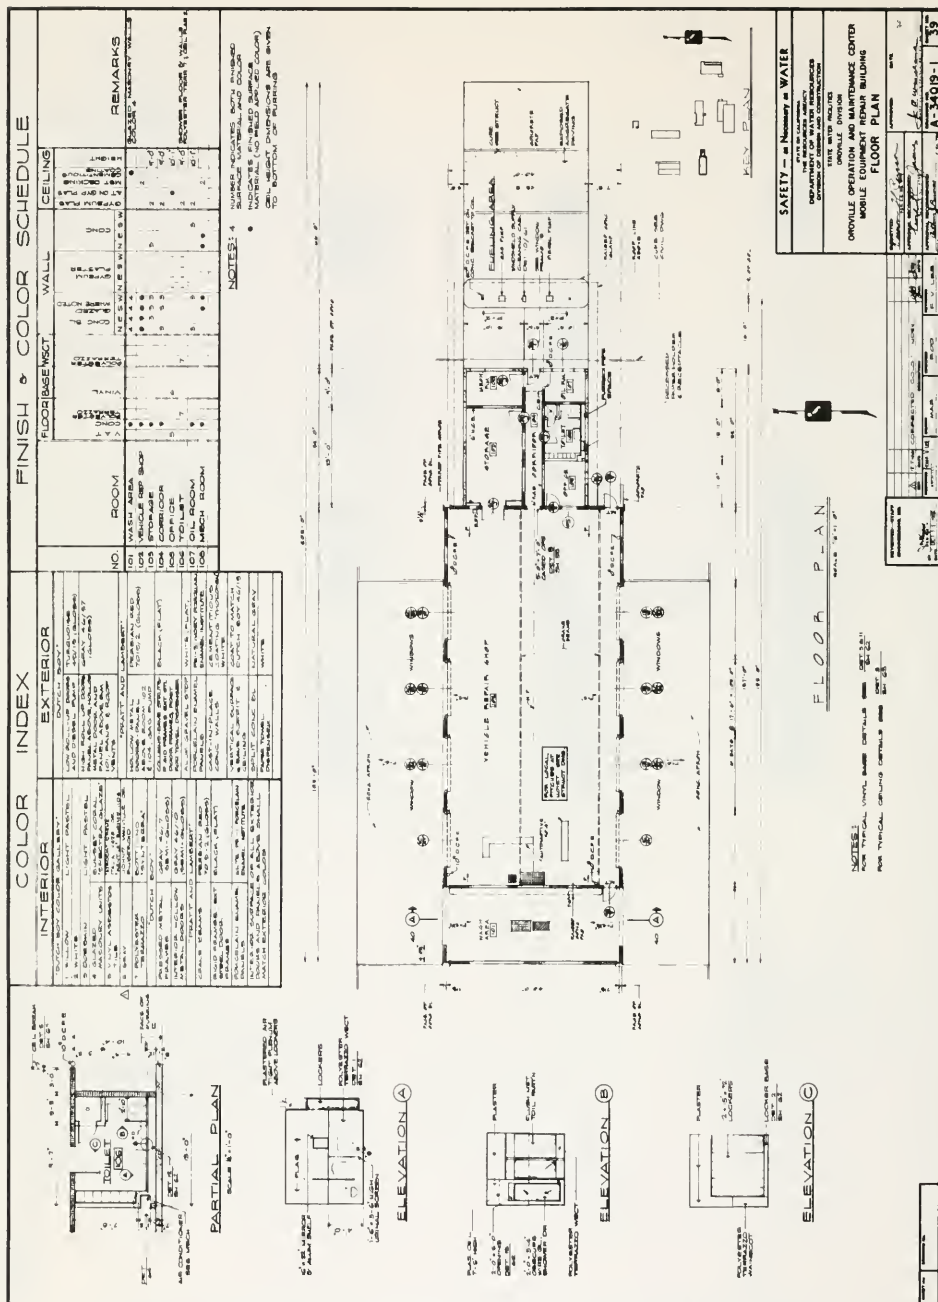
Oroville Operations and Maintenance Center Mobile Equipment Repair Building—Floor Plan
